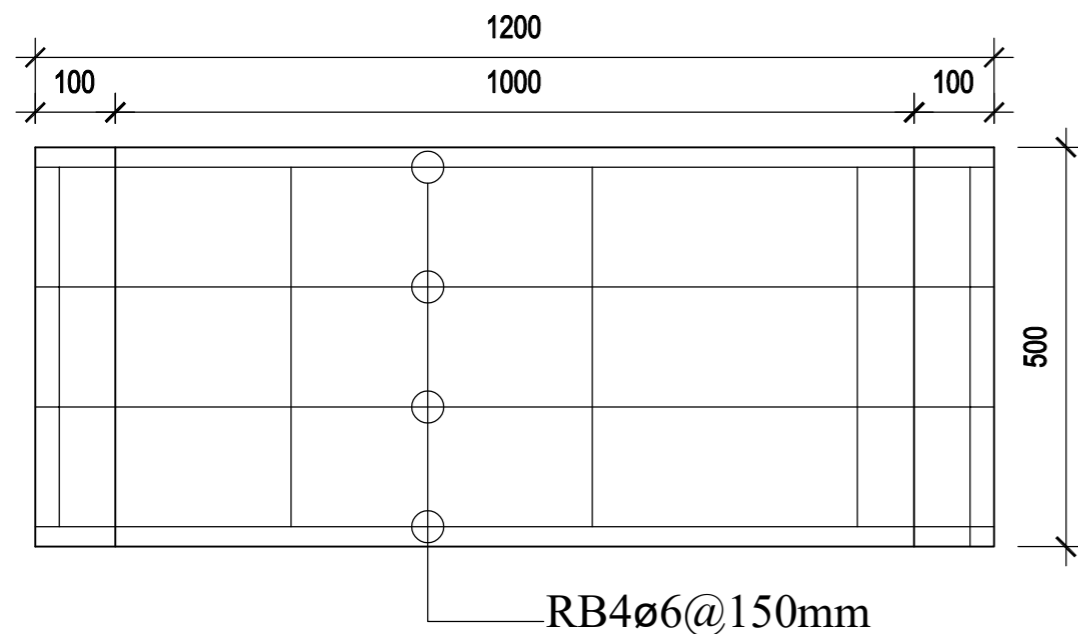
# DETAIL REINFORCEMENT FOR RC PIPE AND COVER
